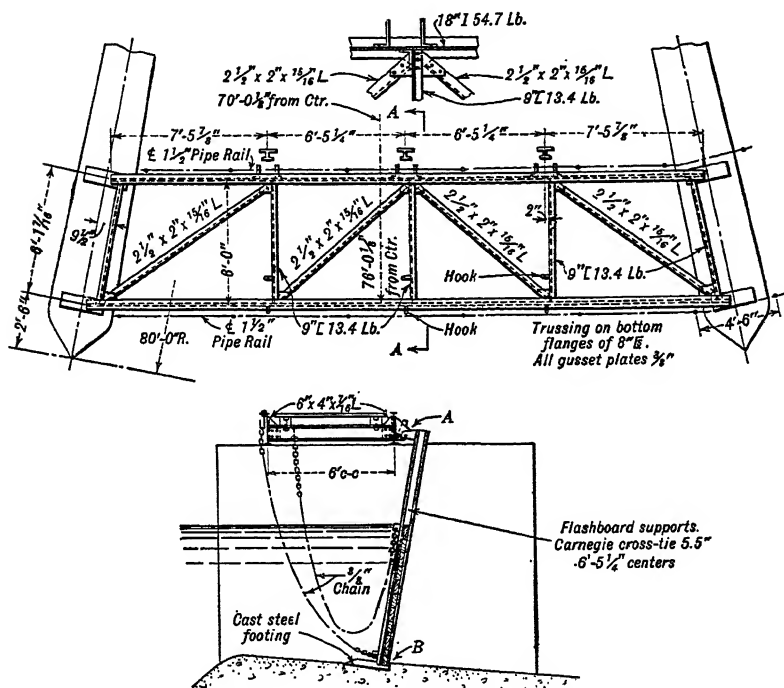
Details of flashboard device, Davis Bridge spillway. (E. A. Dow at spring meeting, Am. Soc. Mech. Engrs., 1925.)
